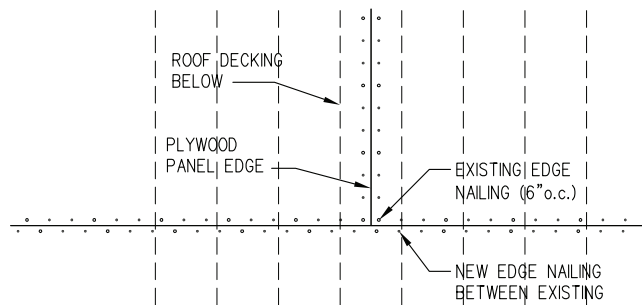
G: PLAN OF PLYWOOD PANEL EDGE NAILING
